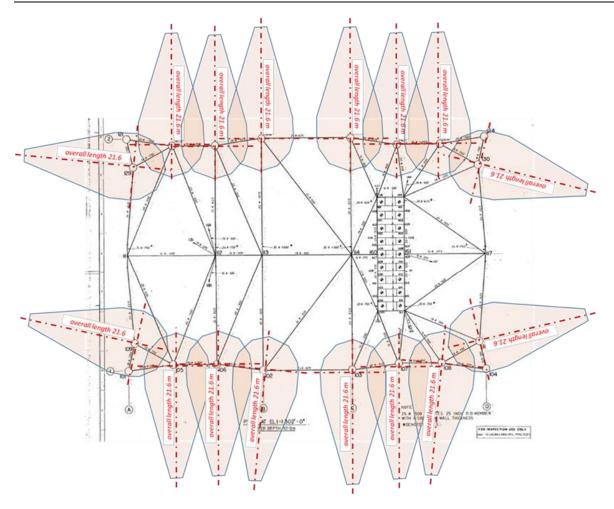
Plan view of Mackerel platform indicative dredging arrangement for external pile cutting
